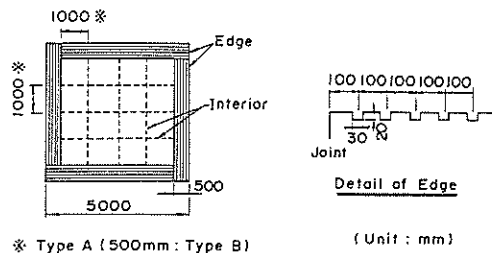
Experimental Thin Bonded Concrete Overlay Pavement
